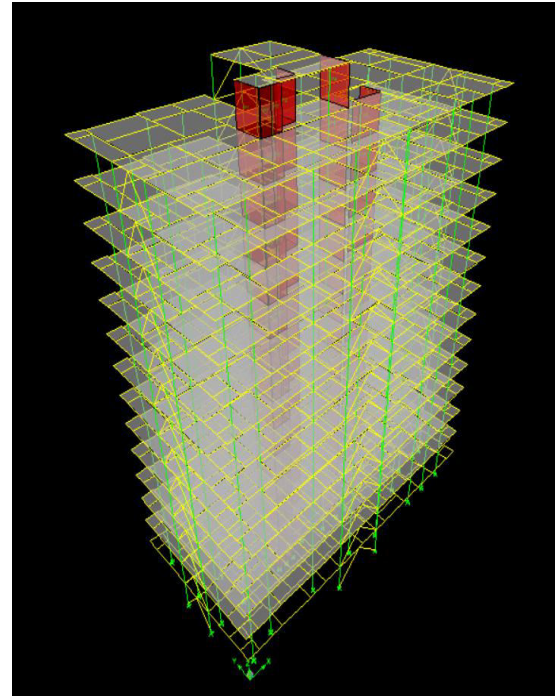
Elevation view of building with inverted V bracing in ETABS
